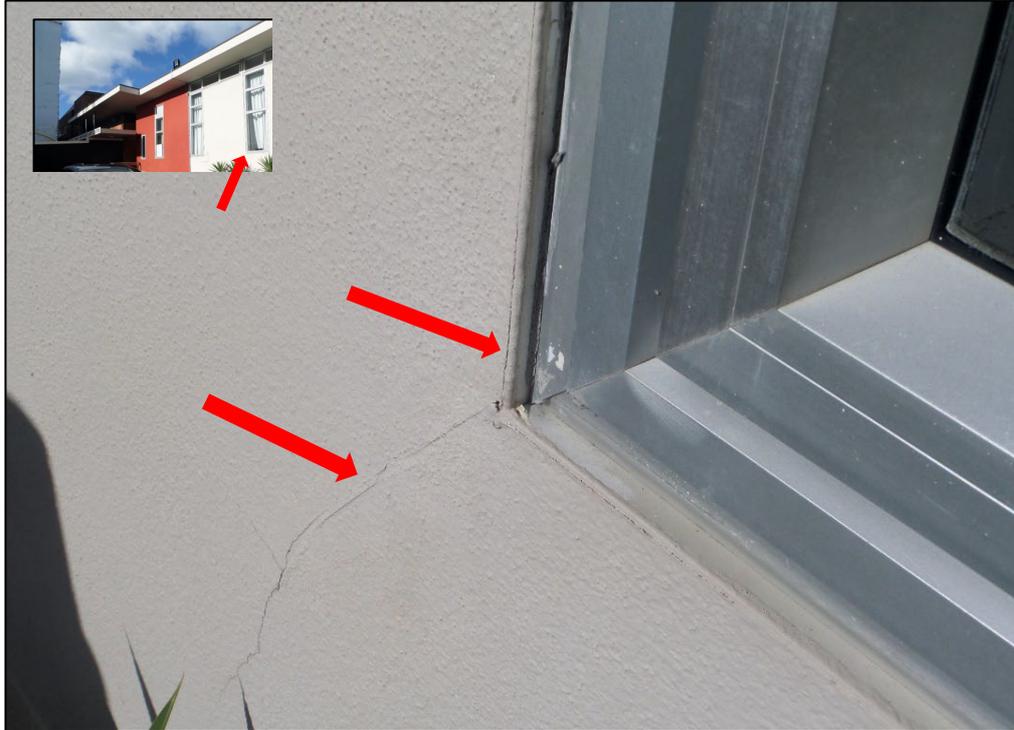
North elevation. Cracking to stucco cladding and window junction. There are no visible control joints in the plaster. Refer next photo
